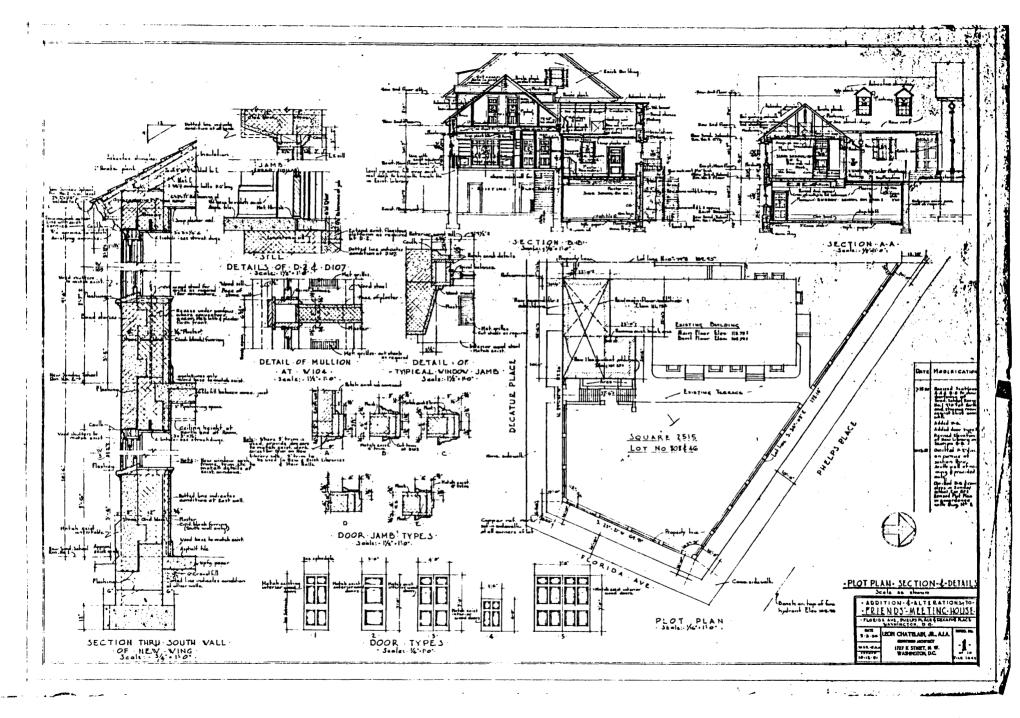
b. Plot Plan, Section and Details 1950 addition.
